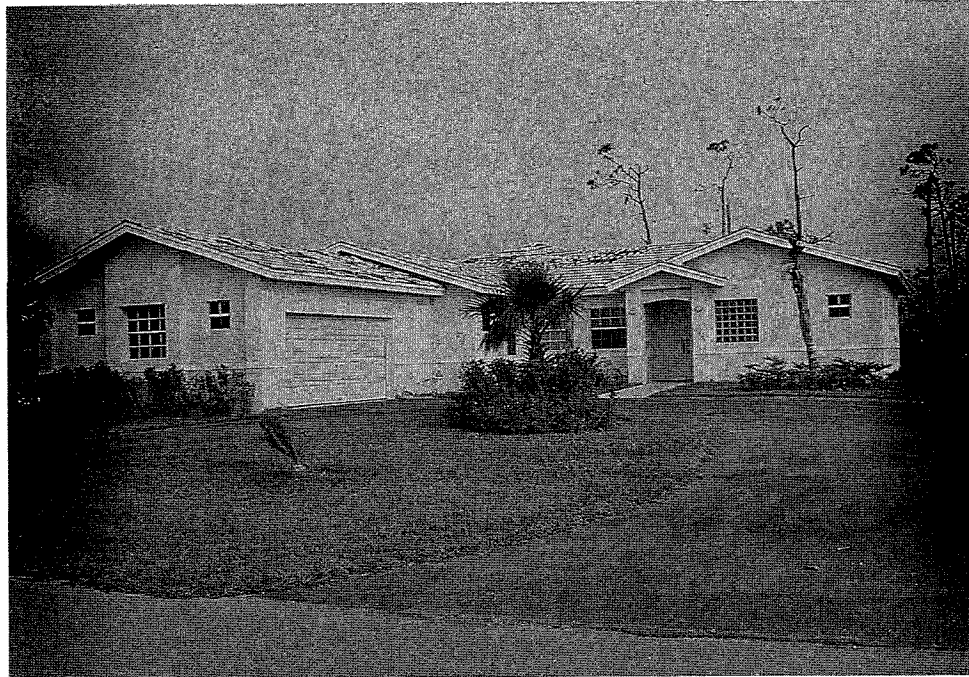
Wind-damaged home with a none to one-third (Level 1) damage rating for the overall building condition. This house had an open inland exposure to the wind. Only one window was broken and the garage door was dented. ("X" means not specified or not accessible to the grader.)
